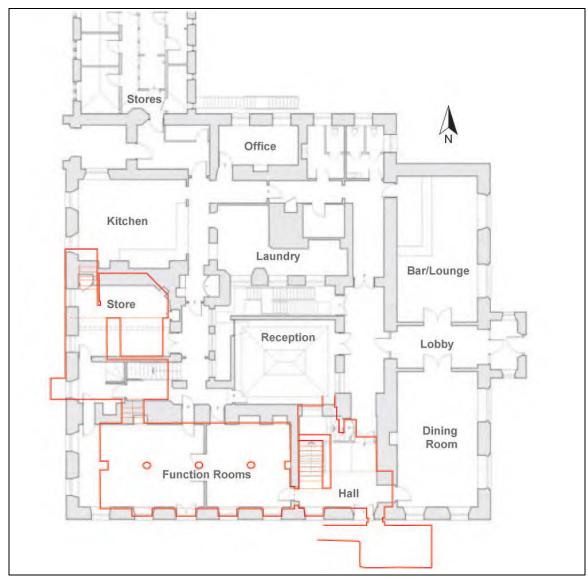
Plan of the cellars (in red) with ground floor plan overlain to show their location, (based on plans supplied by Keith Cook, Architect).
